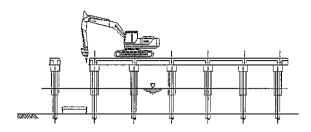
and I-6 show image of the on and off shore construction works which will minimize potential negative environmental impacts.
